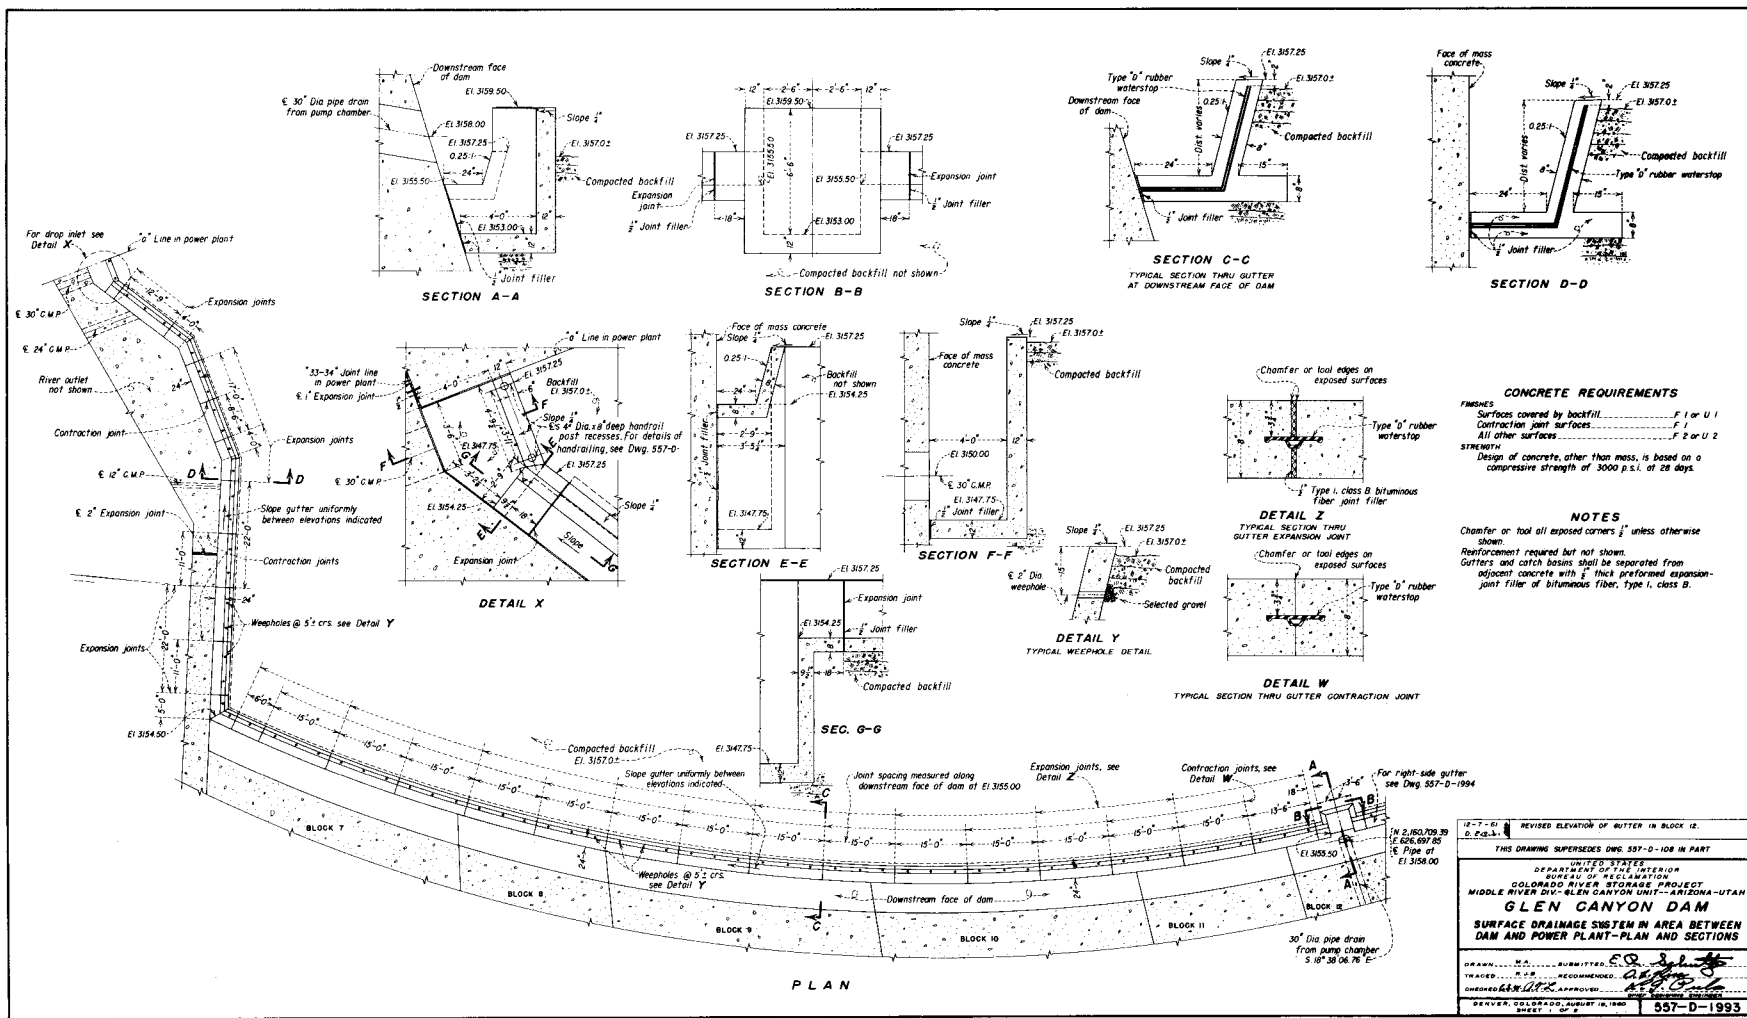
Surface drainage system in area between dam and powerplant—Plan and sections. (Sheet 1 of 2.)
